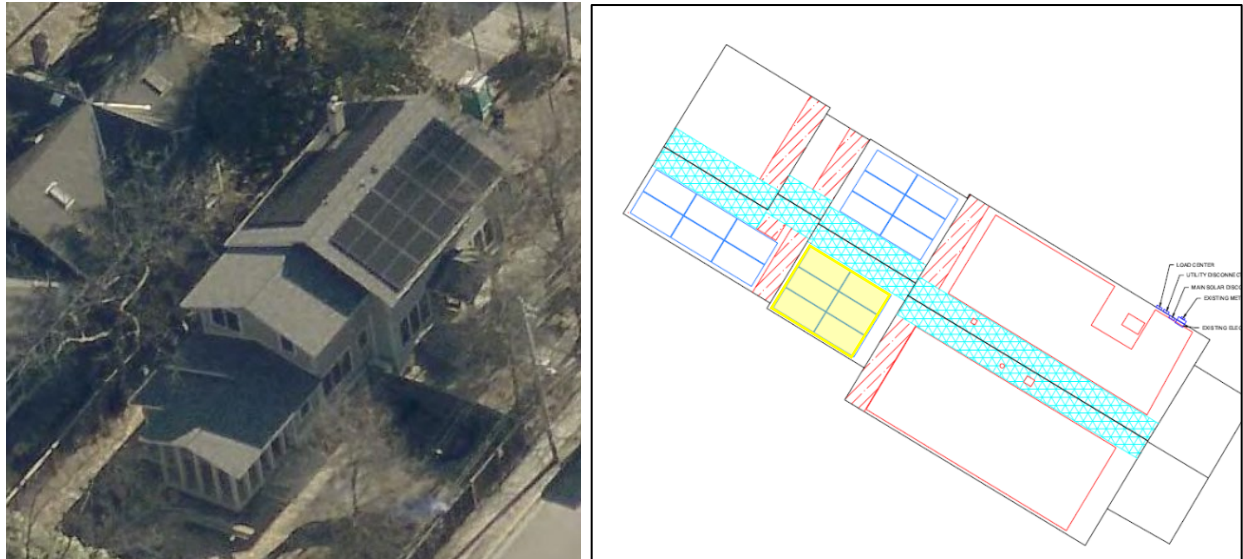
Aerial view of the subject property showing the installed solar panels (left) and the proposed panels (right). Staff recommends that the six panels on the south roof plane (highlighted in yellow) be moved to the right/east and centered on the roof plane.
